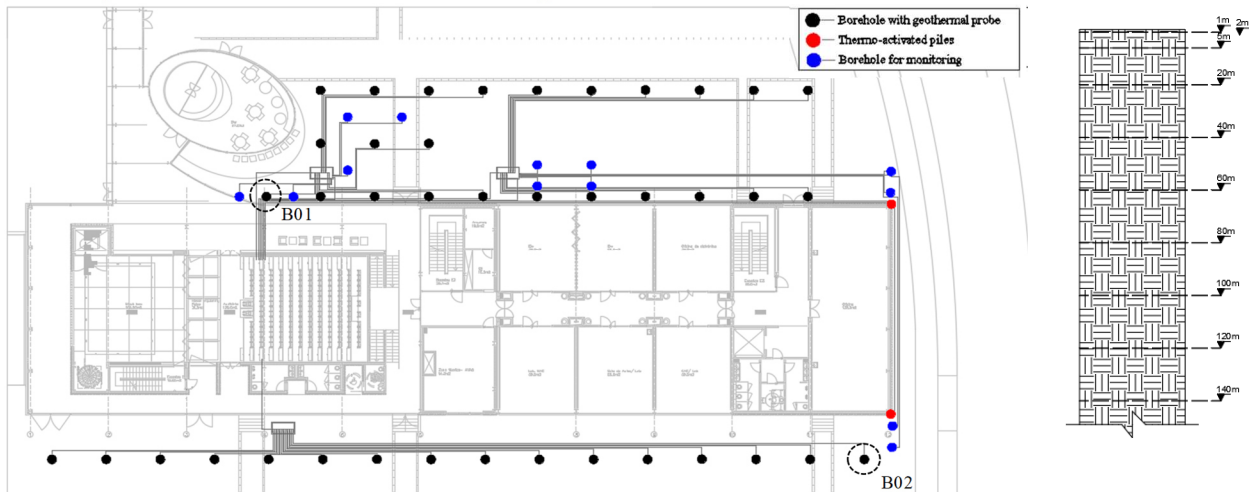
Monitoring plan: (a) boreholes plan distribution; (b) schematic view of a cross section.
